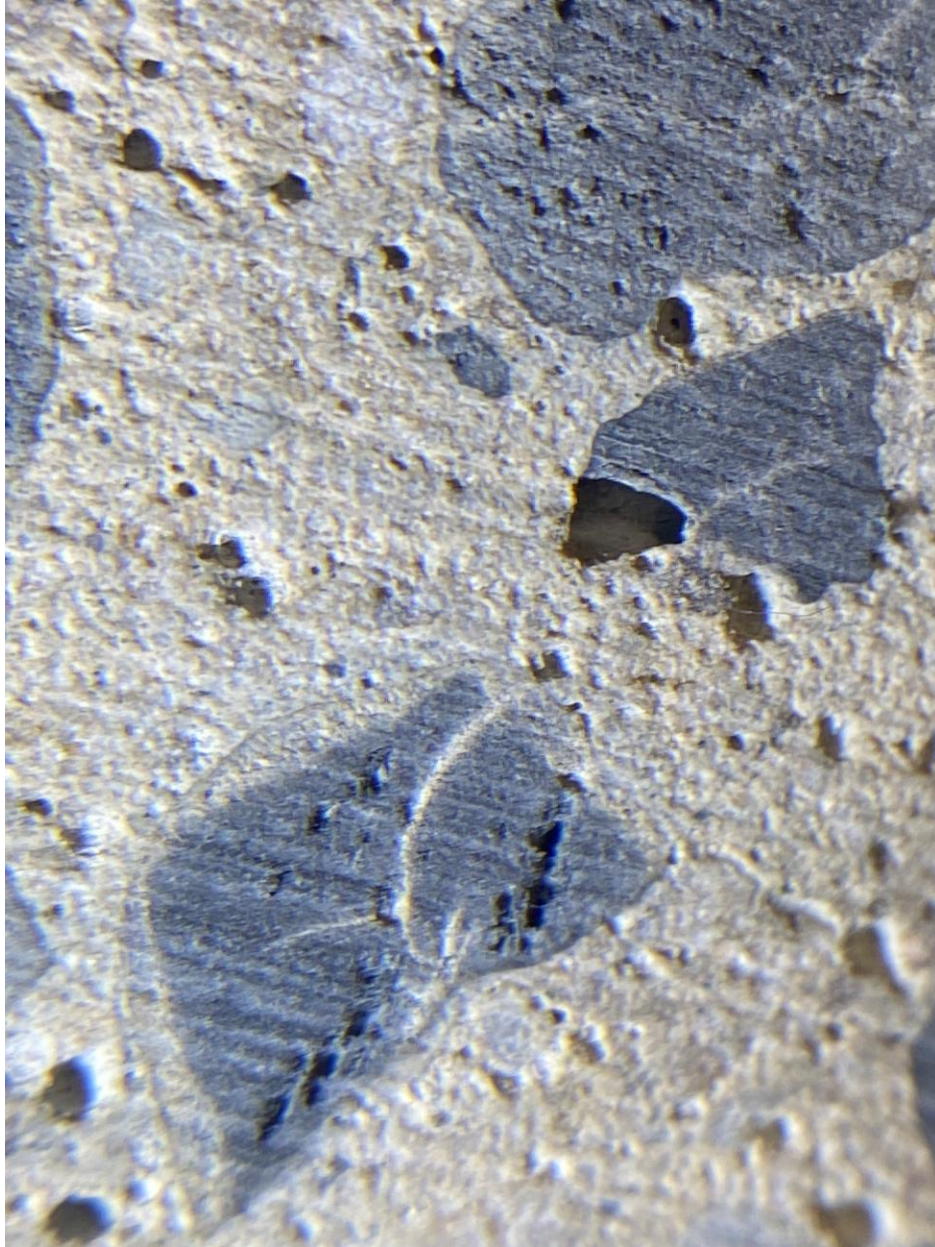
Aggregate in core 1 of lightweight concrete deck at bridge C-1011 (2).
